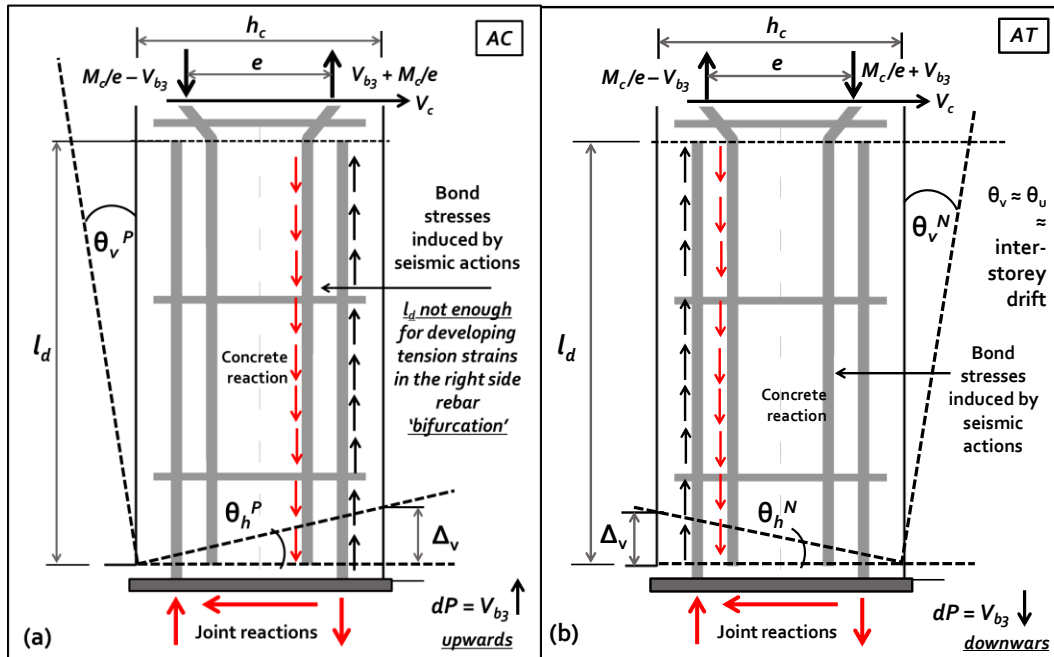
Top floor column rocking on top of second floor joints towards the left.
